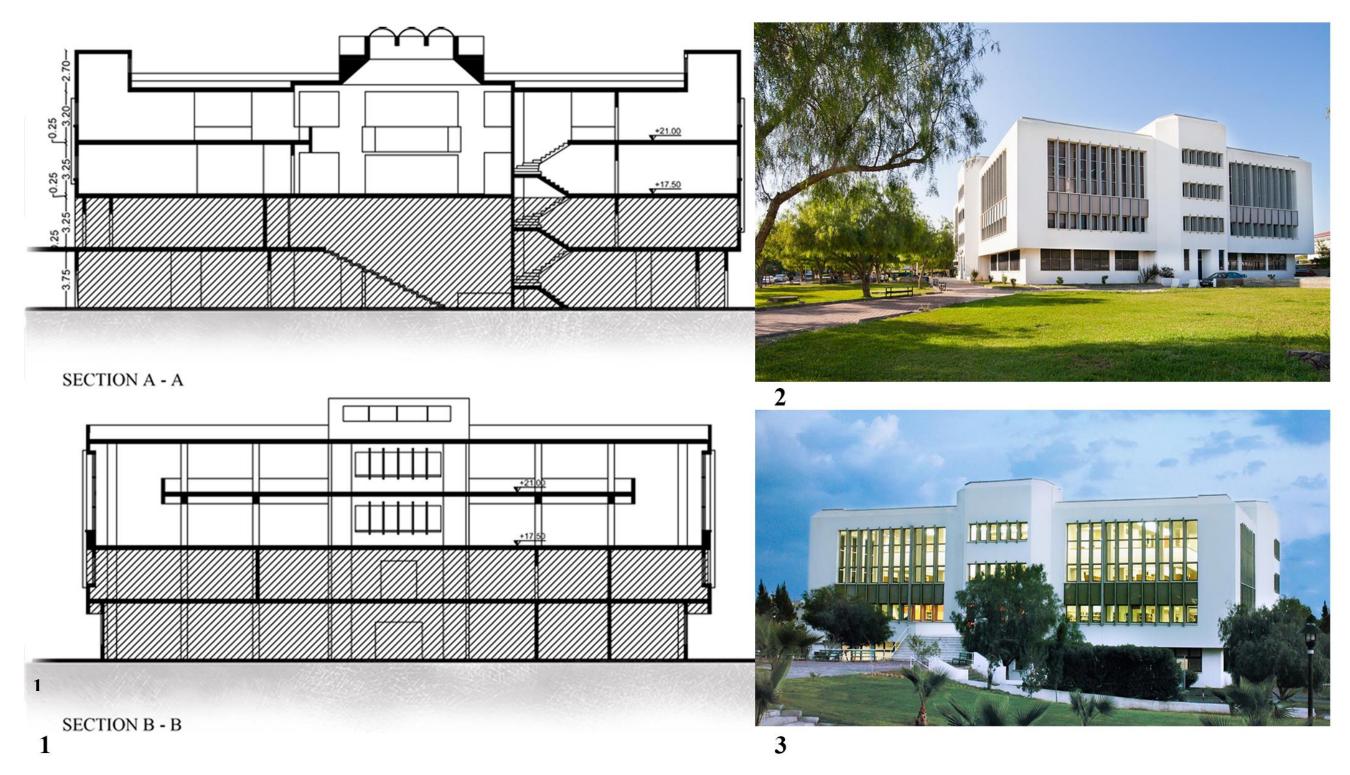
1: Sections, Scale 1:250. Drawn by the author. 2: South-East Elevation. 3: North-West Elevation. Source: URL 3
